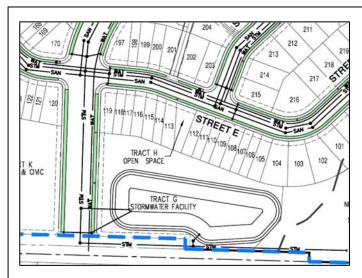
Conceptual locations for onstreet stormwater planters and/or swales in the PPCMP
